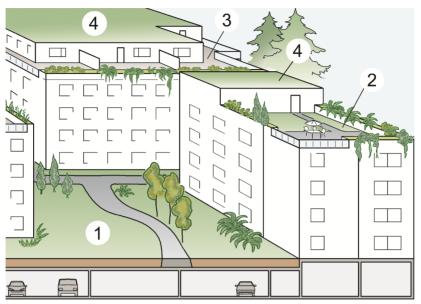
Green and blue-green roofs in a typical residential construction project: (1) intensive green roof, park, built for vehicle access; (2) roof terrace with lawns and flowerbeds; (3) roof terrace with permeable paving, a "blue-grey roof"; (4) lightweight, extensive Sedum roof. Illustration: SINTEF/Klima 2050
